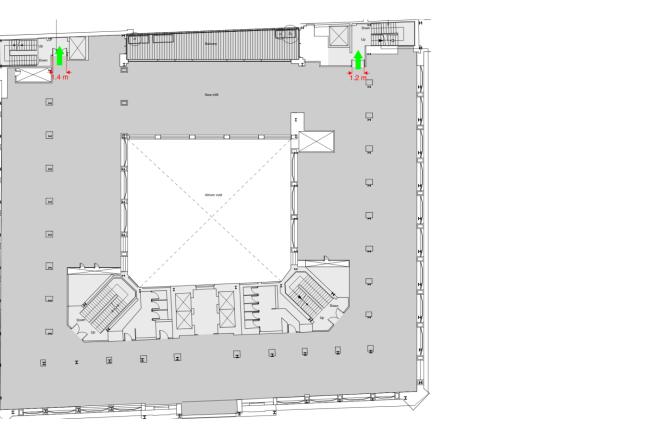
Typical Upper Floor Level (1 to 8) available exits considered in the horizontal egress capacity assessment – final drawing still under development
